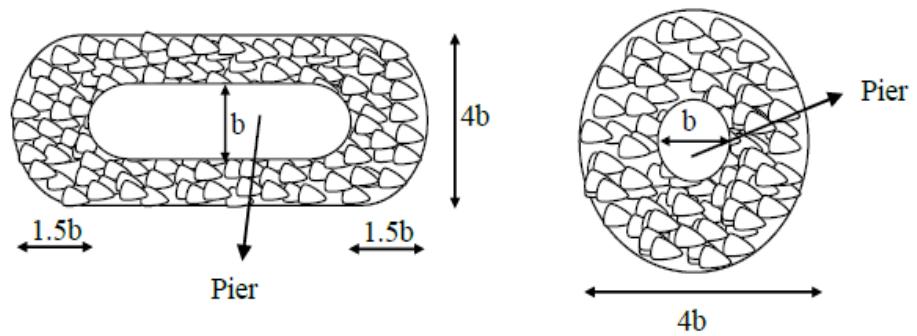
Design details of partially grouted riprap (Lagasse et al., 2007)
